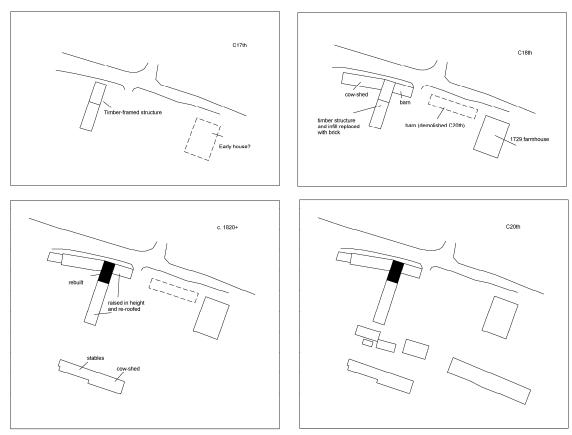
Block plans showing outline chronology of Hemington House Farm.
